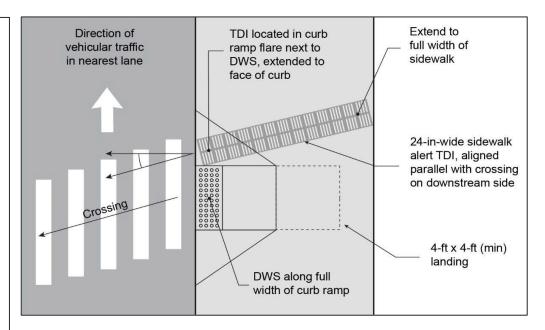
Example of TWSIs for a Typical Midblock or Roundabout Street Crossing for a Narrow Curb Ramps with Flares. [O'Brien, et al. (2024). TCRP Research Report 248]
